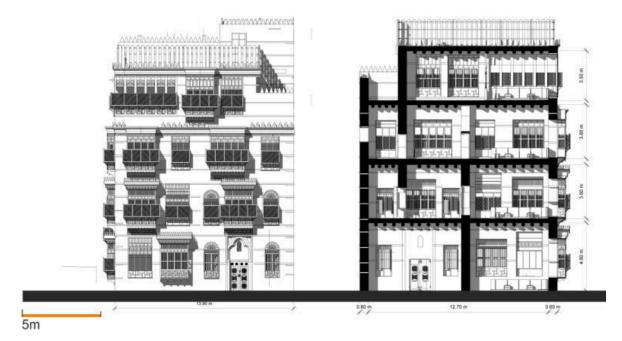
Left, west elevation of Bait Waqf Al Shafi. Right a section of the house. Source: (Khan, 2015, p. 183).
